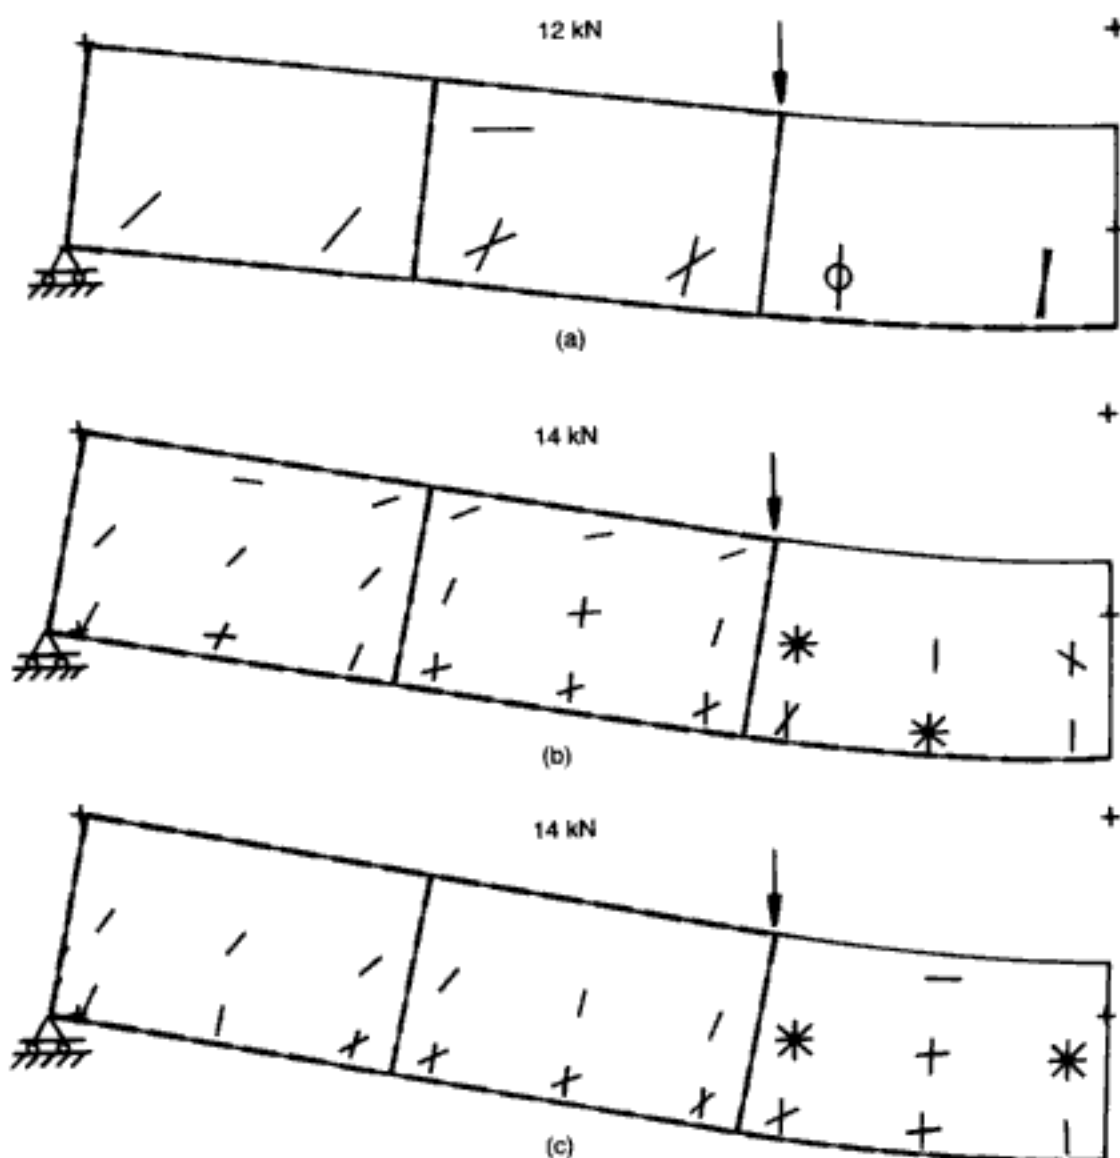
(facing). RC beam under two-point loading (CS2). Crack patterns and deformed shapes at various load stages for run 4 (12 HX20A elements)¹⁶⁵
